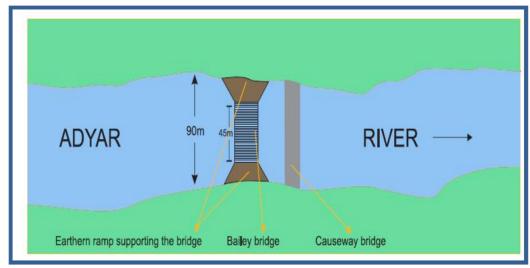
Ramp of Bailey bridge protruding into Adyar River
